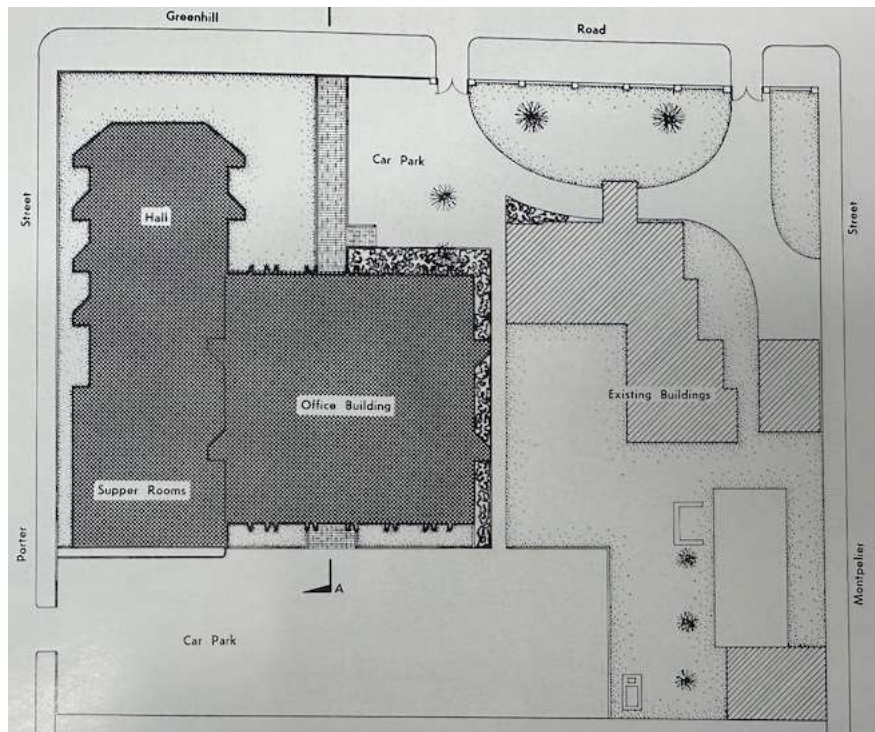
SAIT site plan, 1971 [Source: Morrish 1971:35]
